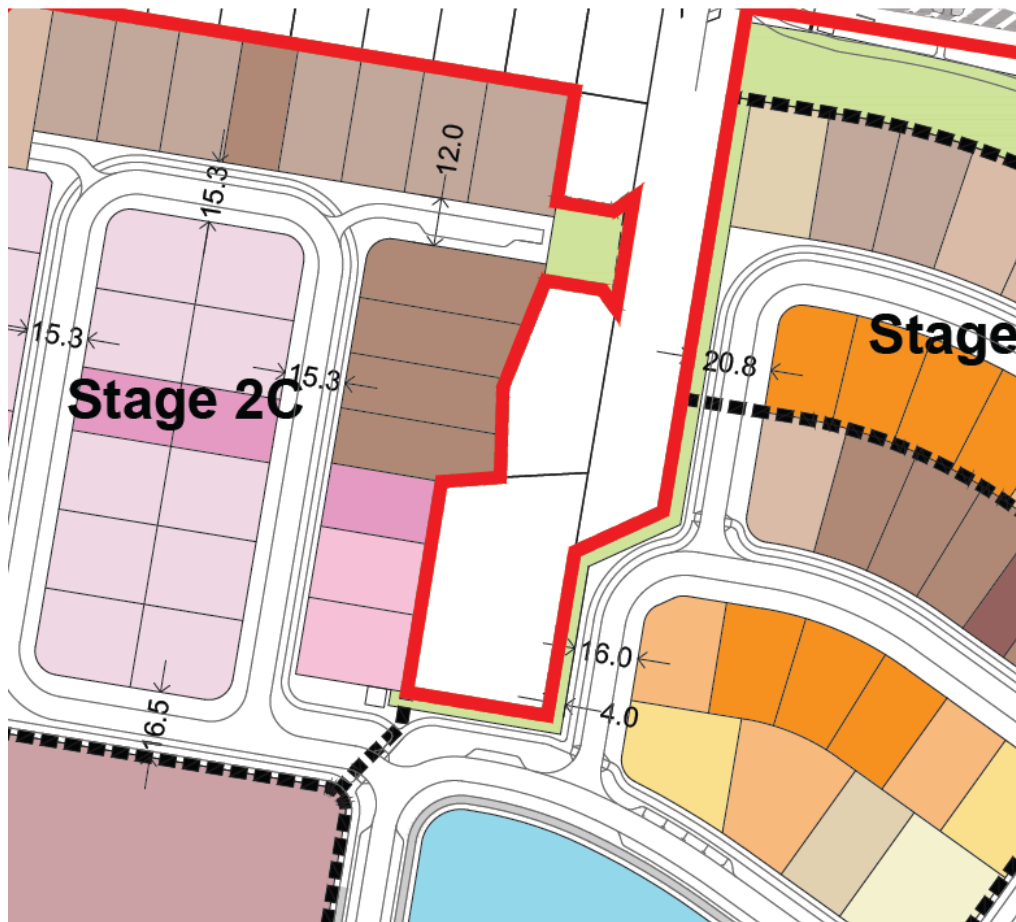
Plan showing properties adjoining the proposed Twin Waters West development
